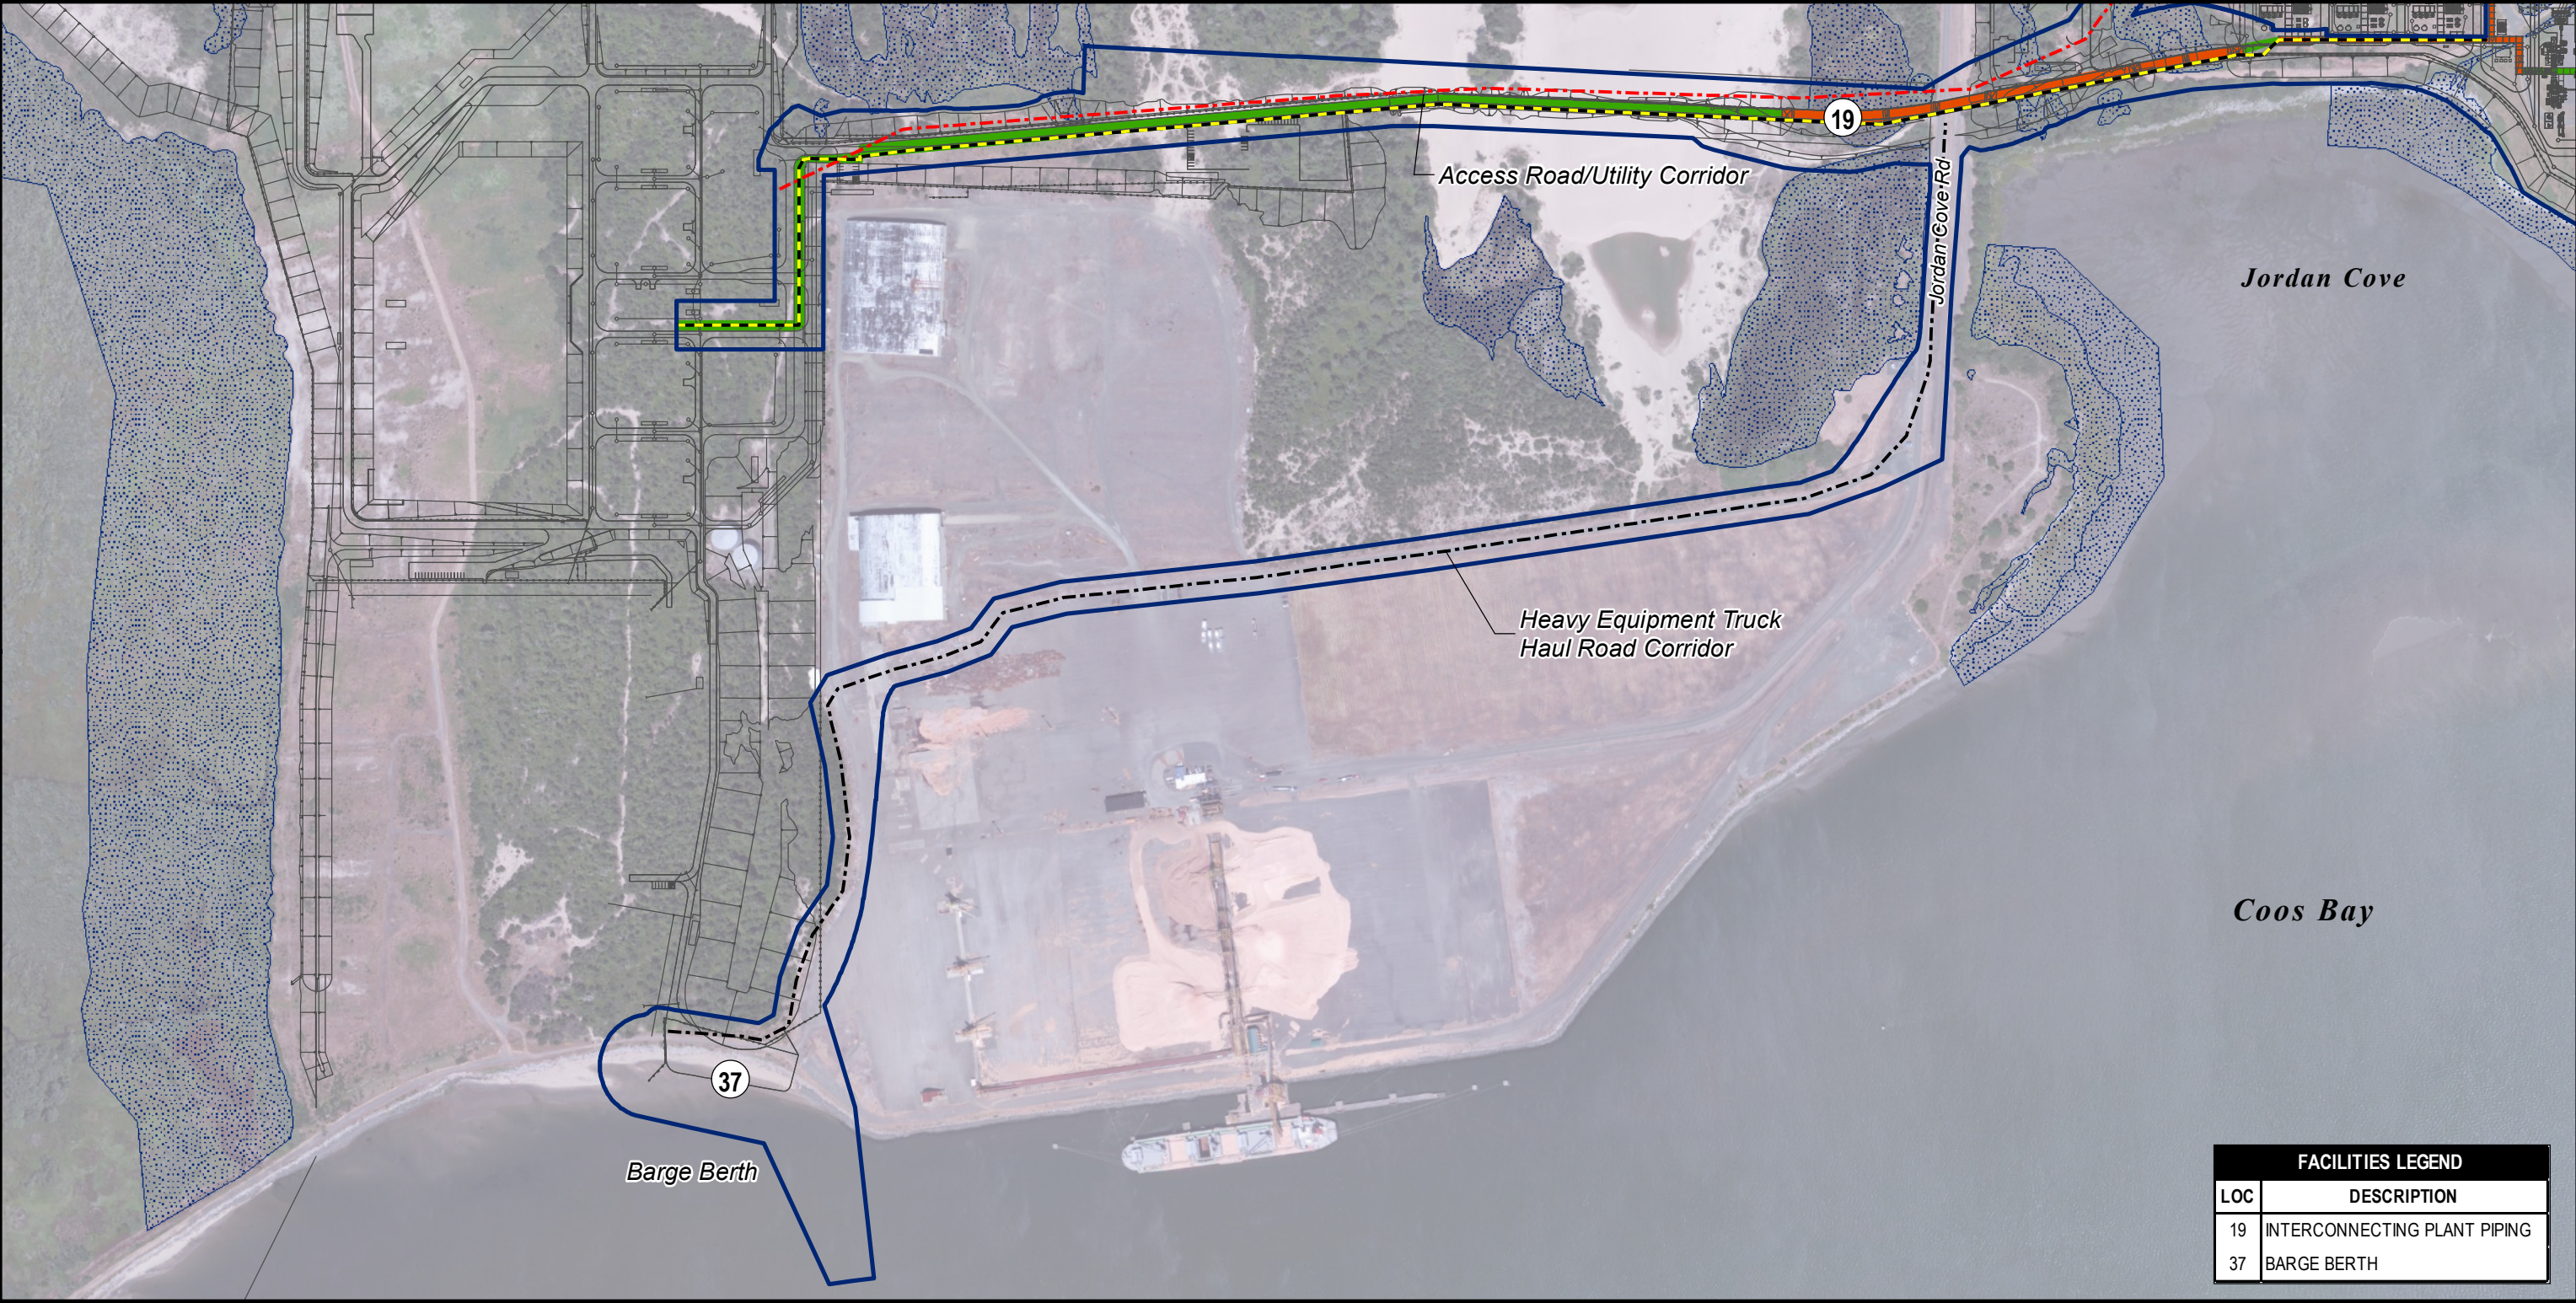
Sheet 2. Facility Layout with Above and Below Ground Gas Lines
